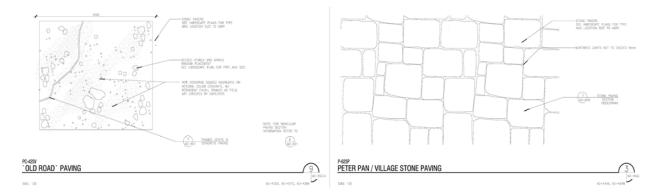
Two sample details of paving patterns simulating a dirt road and stone paving.
